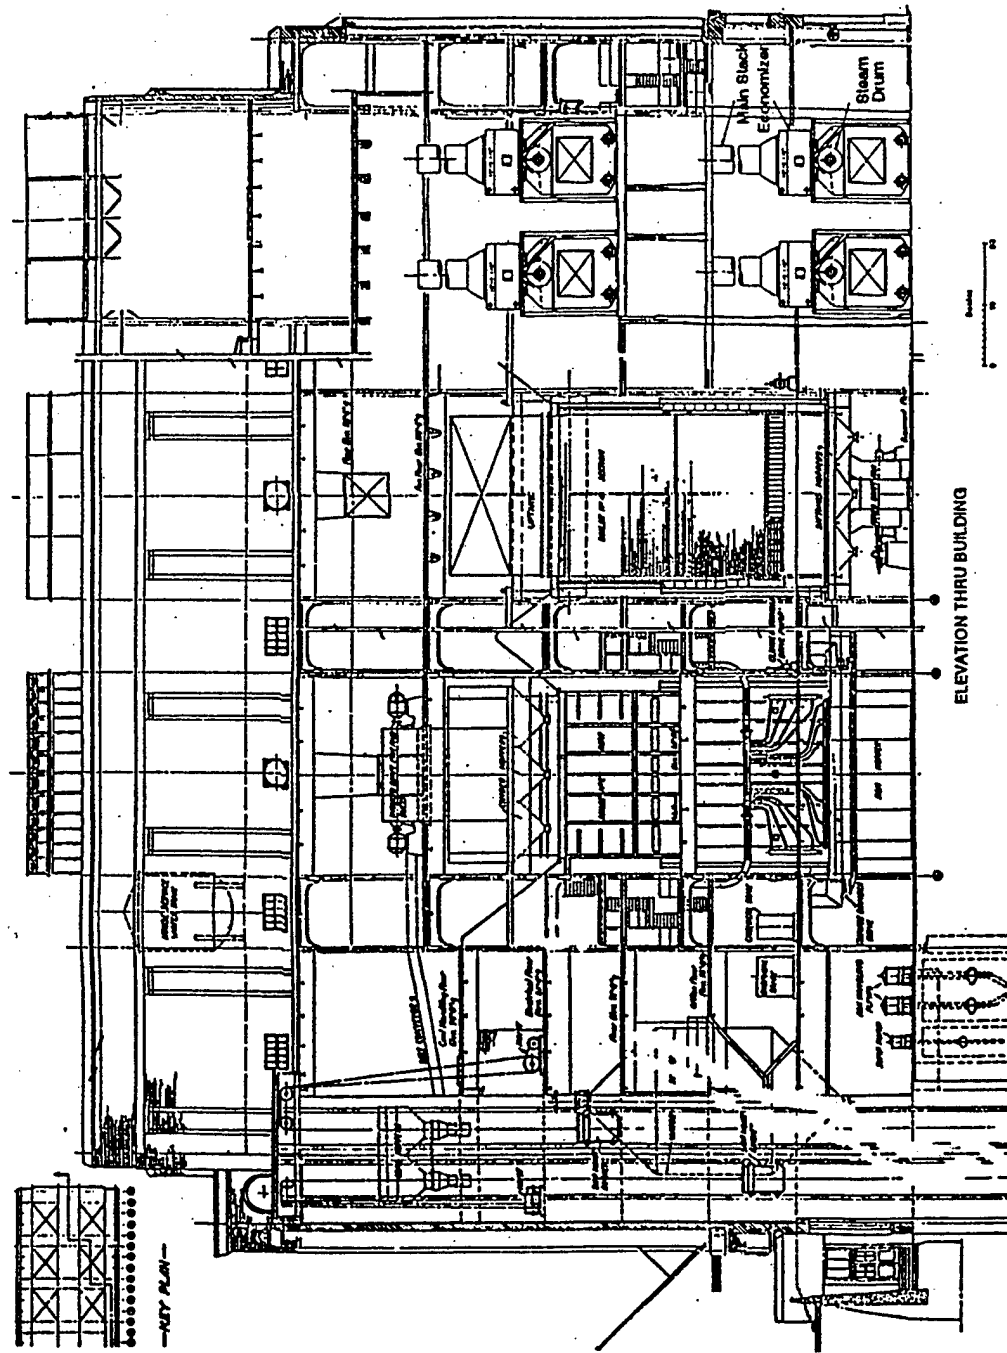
B. Four Solar 3.5 MW Combustion Turbine 100,000 lb/hr HRSG Arrangement in Central Heating Plant Building Sectional Elevation at HRSGs
